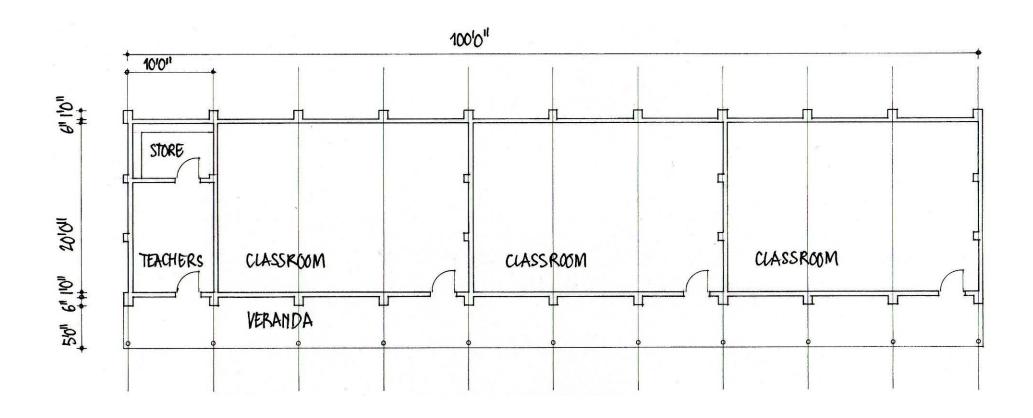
6-Classroom Primary School: 4-Classroom Building
